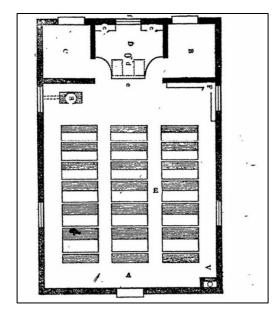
Prospective one-room schoolhouse floorplan (*The School House, Its Architecture, External and Internal Arrangements*, p. 45)
